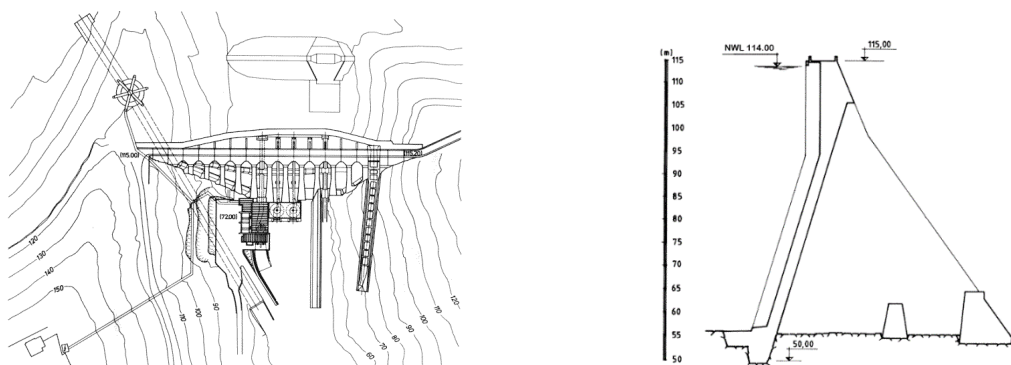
Pracana dam: plan on the left; cross section on the right (CNPGB).
